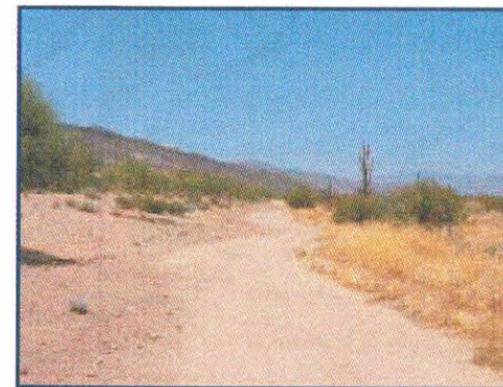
Existing Unpaved Multi-use Path in Tramonto Subdivision
